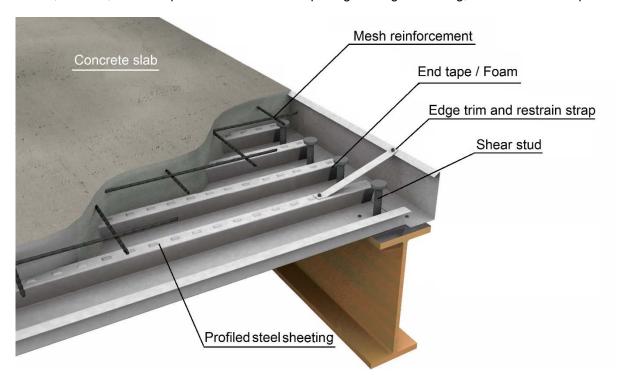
Schematization of a composite slab with profiled steel sheeting.
